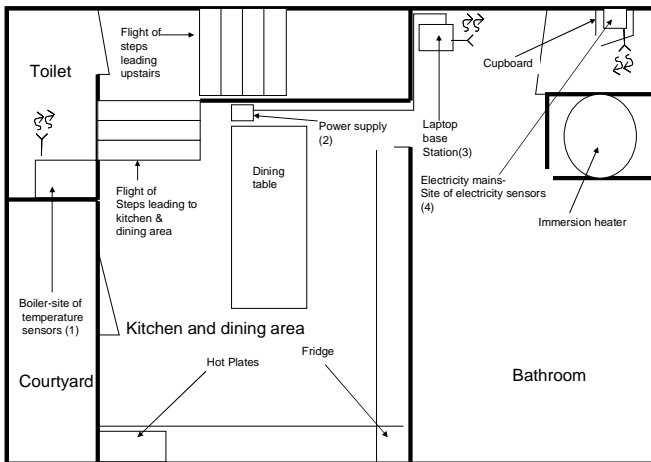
Plan of the Kitchen and bathroom areas showing placement of our technology
